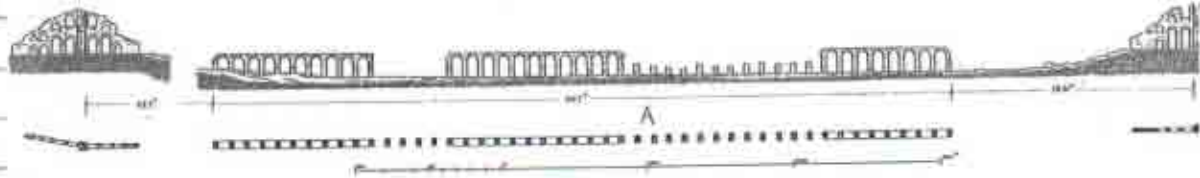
Hydraulic towers and venter bridge in between (Lanckoronski 1890).
